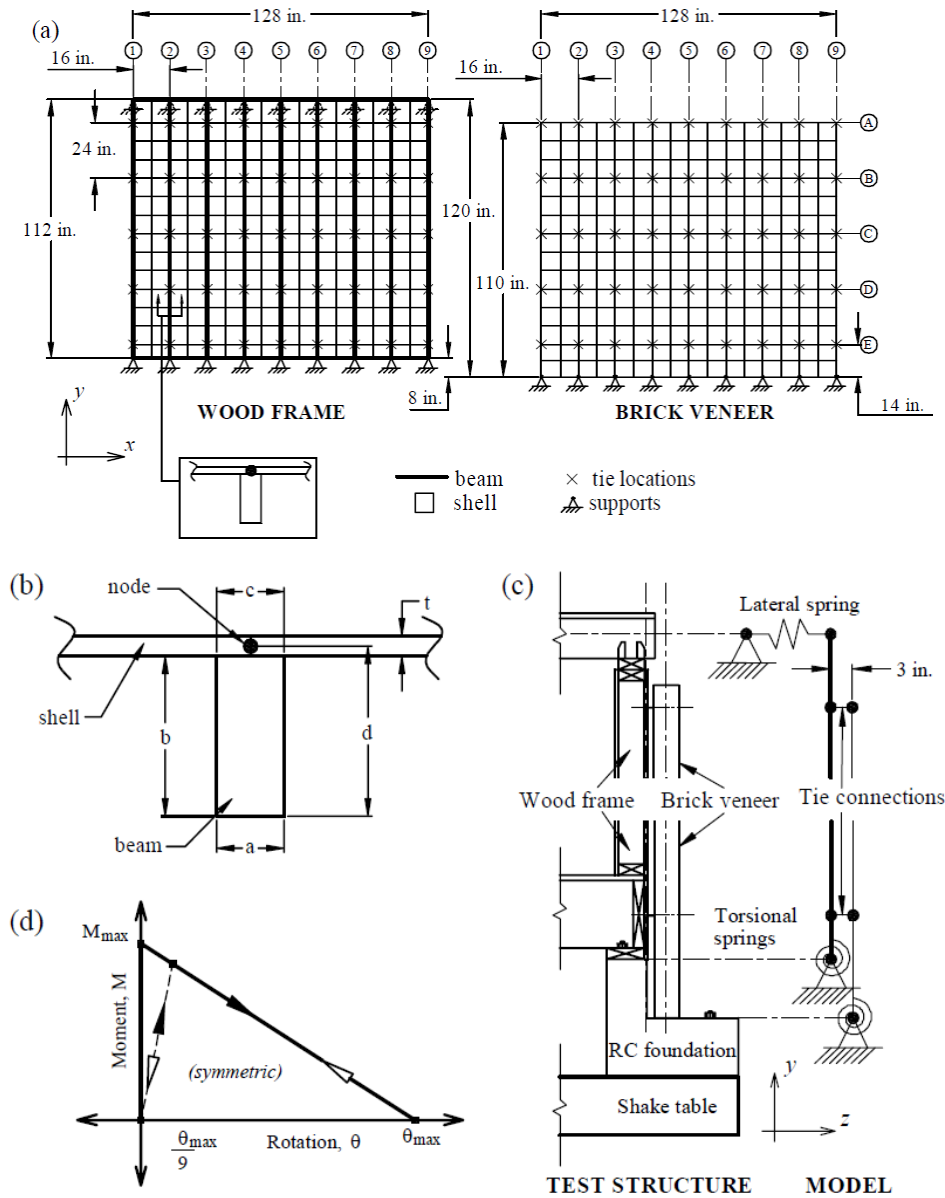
Details of the numerical model by Reneckis and La Fave (2009) [14]: (a) finite element model of the wood frame and masonry veneer; (b) stiffened shell model (OSB sheathing with stud), (c) wall support details, and (d) bilinear elastic brick masonry rocking behaviour model.
